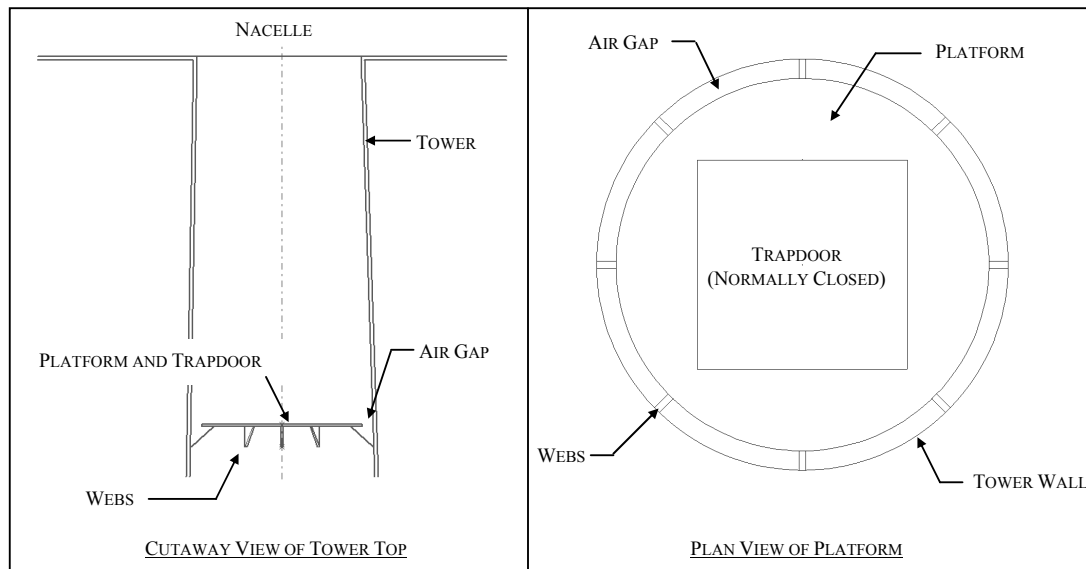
Tower Platform / Muffler Outlet Schematic
